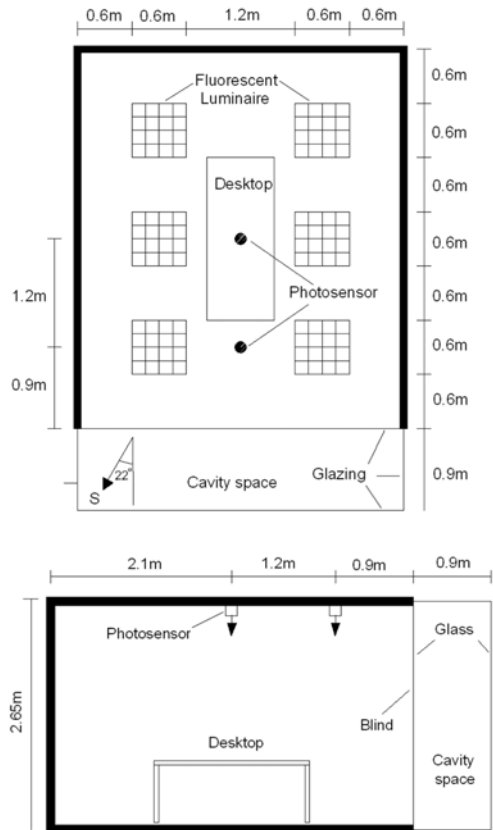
Layout of full-scale mock-up model space (top: plan, bottom: section) (Yoon, Moon & Kim 2015).
